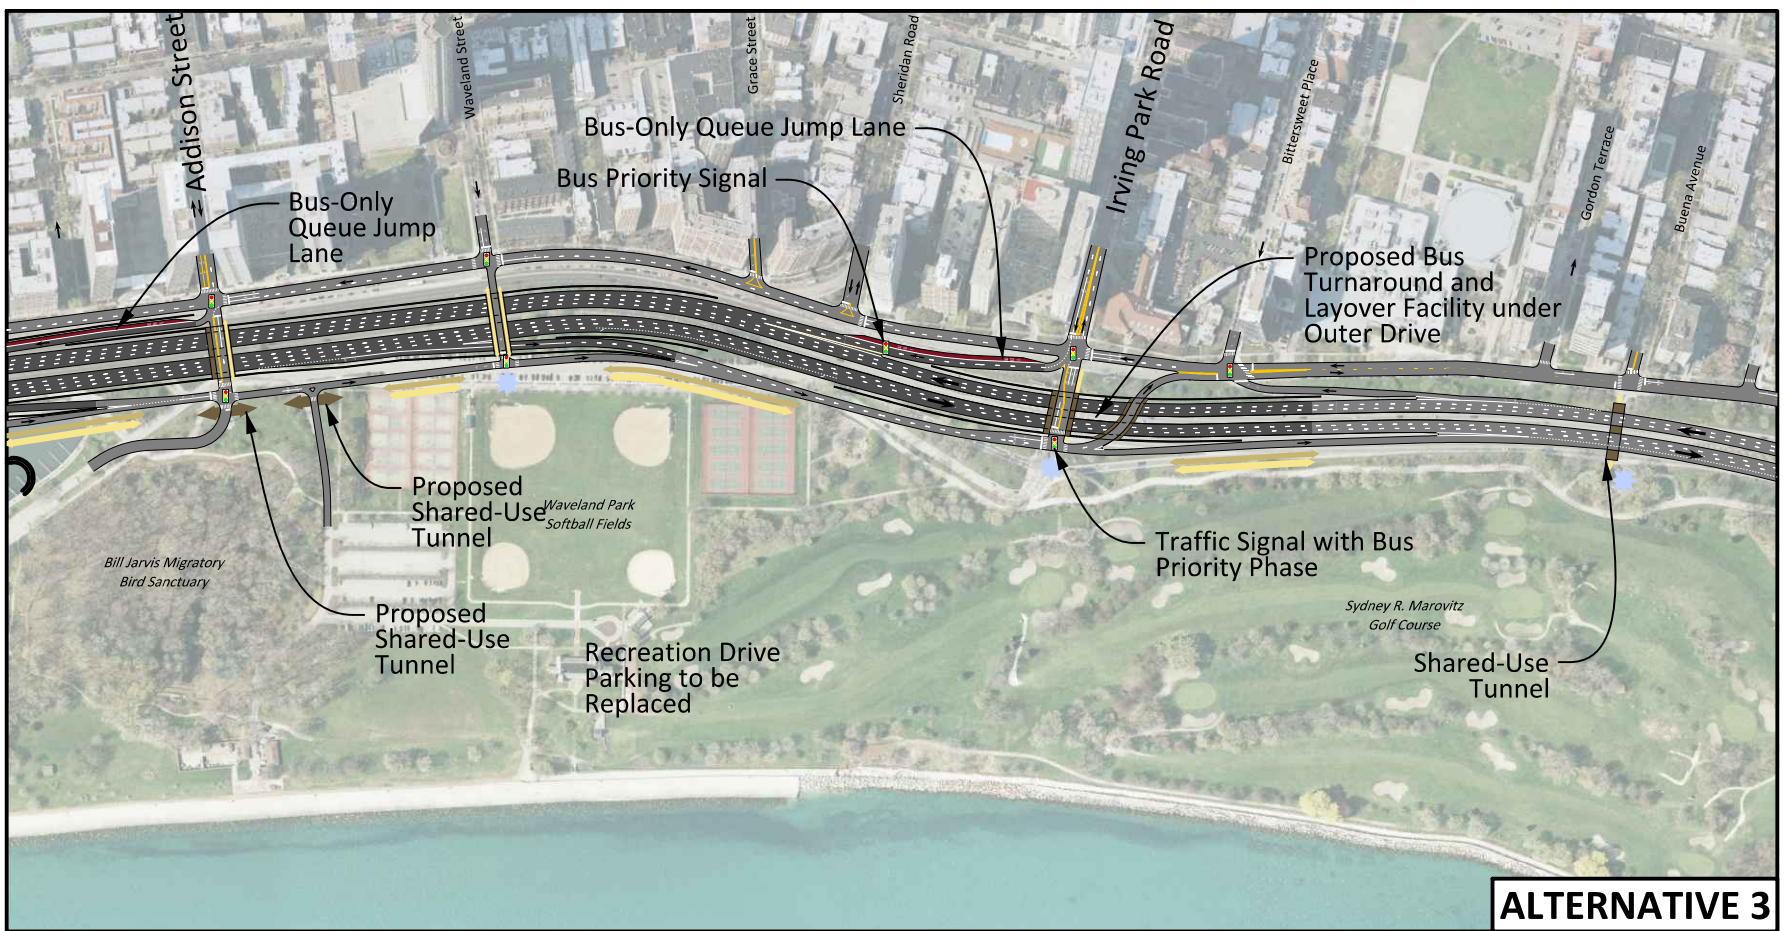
Addison Avenue and Irving Park Road Junction Alternatives
